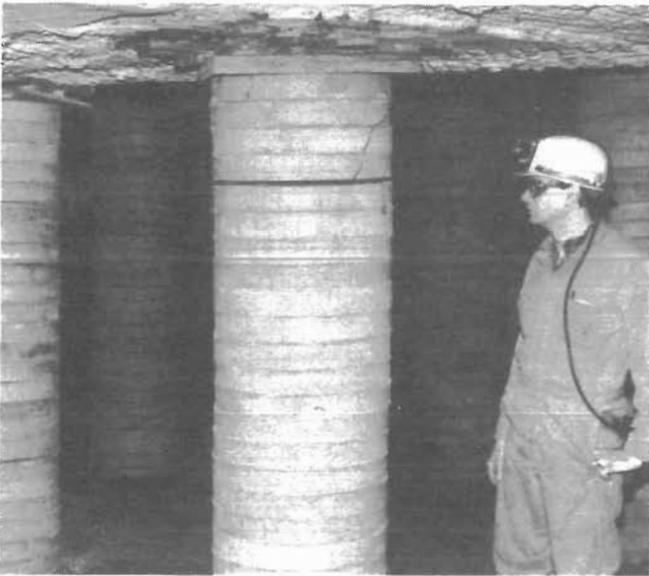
Hydraulic flatjack arrangement in donut crib.
